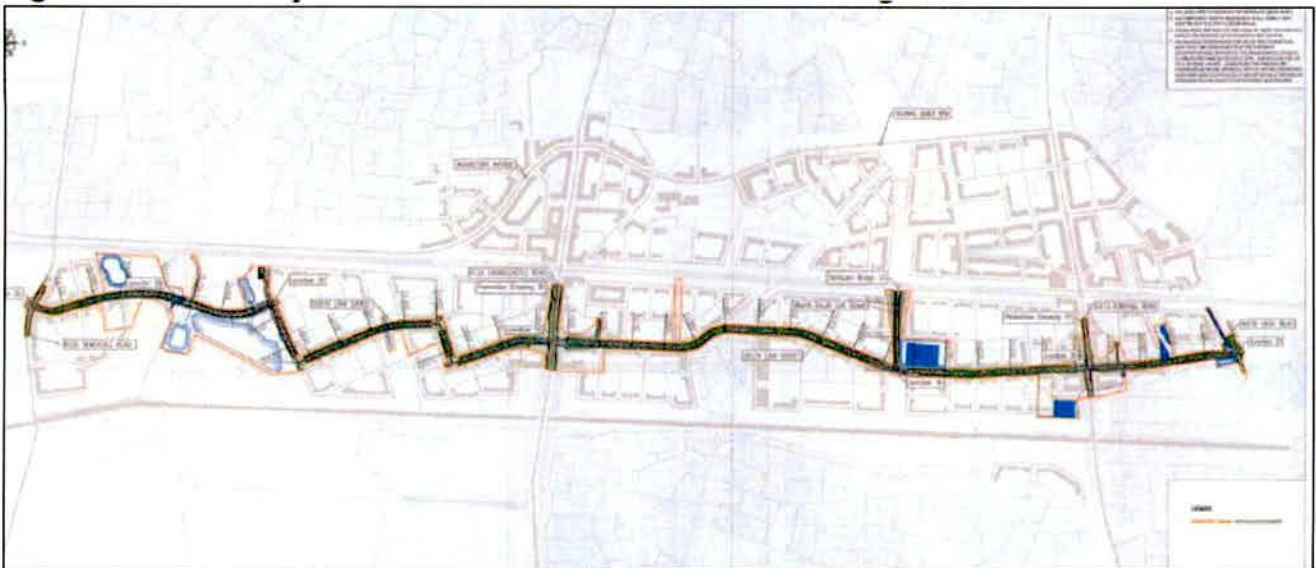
Site Layout Ref. SDZ20A/0021 – Roads and Drainage Infrastructure.
